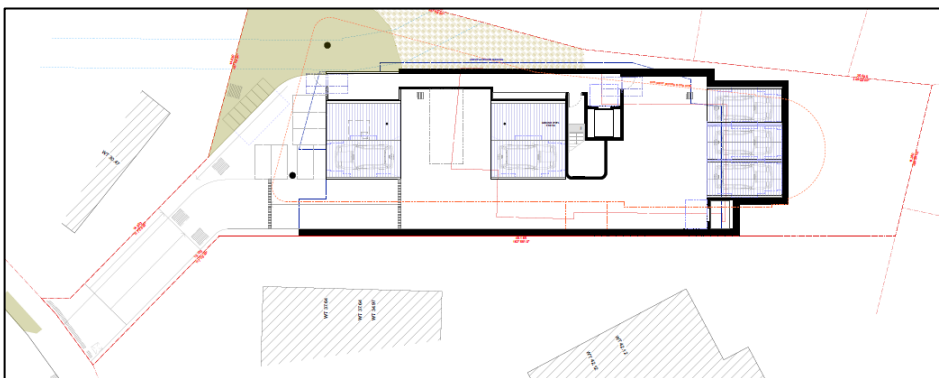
Approved ground floor plan under DA/222/2020 (Source: SHED)
